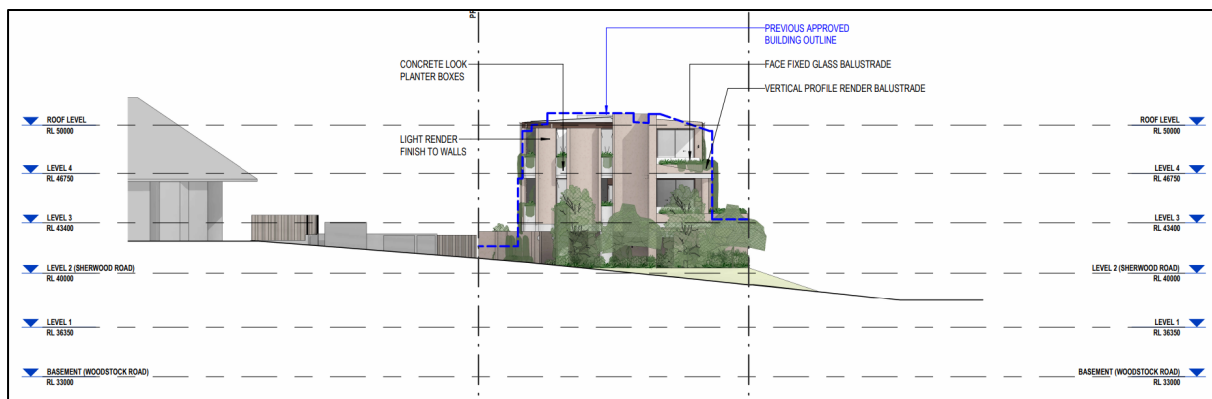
Sherwood Road elevation, with changes highlighted in blue
